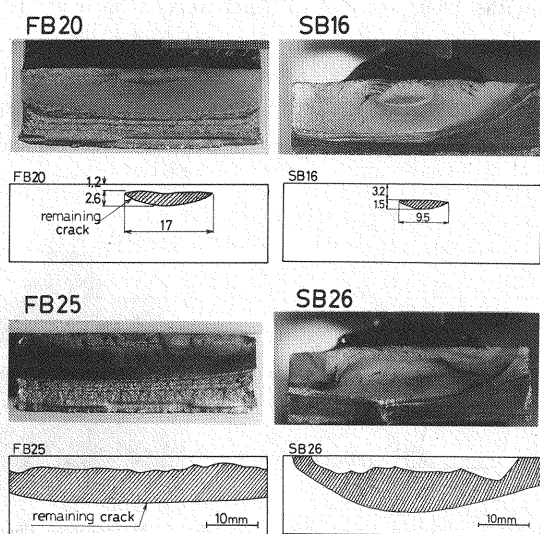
Failure Surfaces of Retrofitted Specimens.
